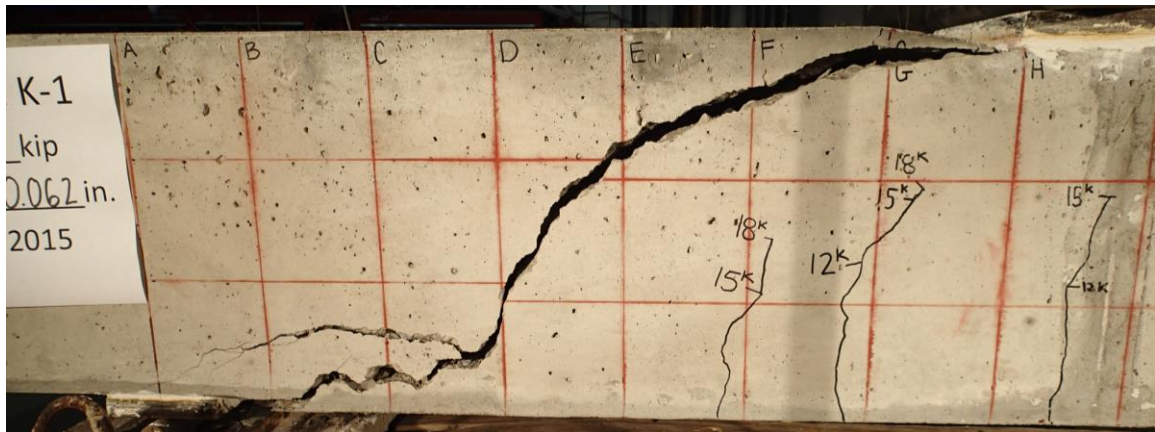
Specimen K-1: North Side Failure Inclined Crack
